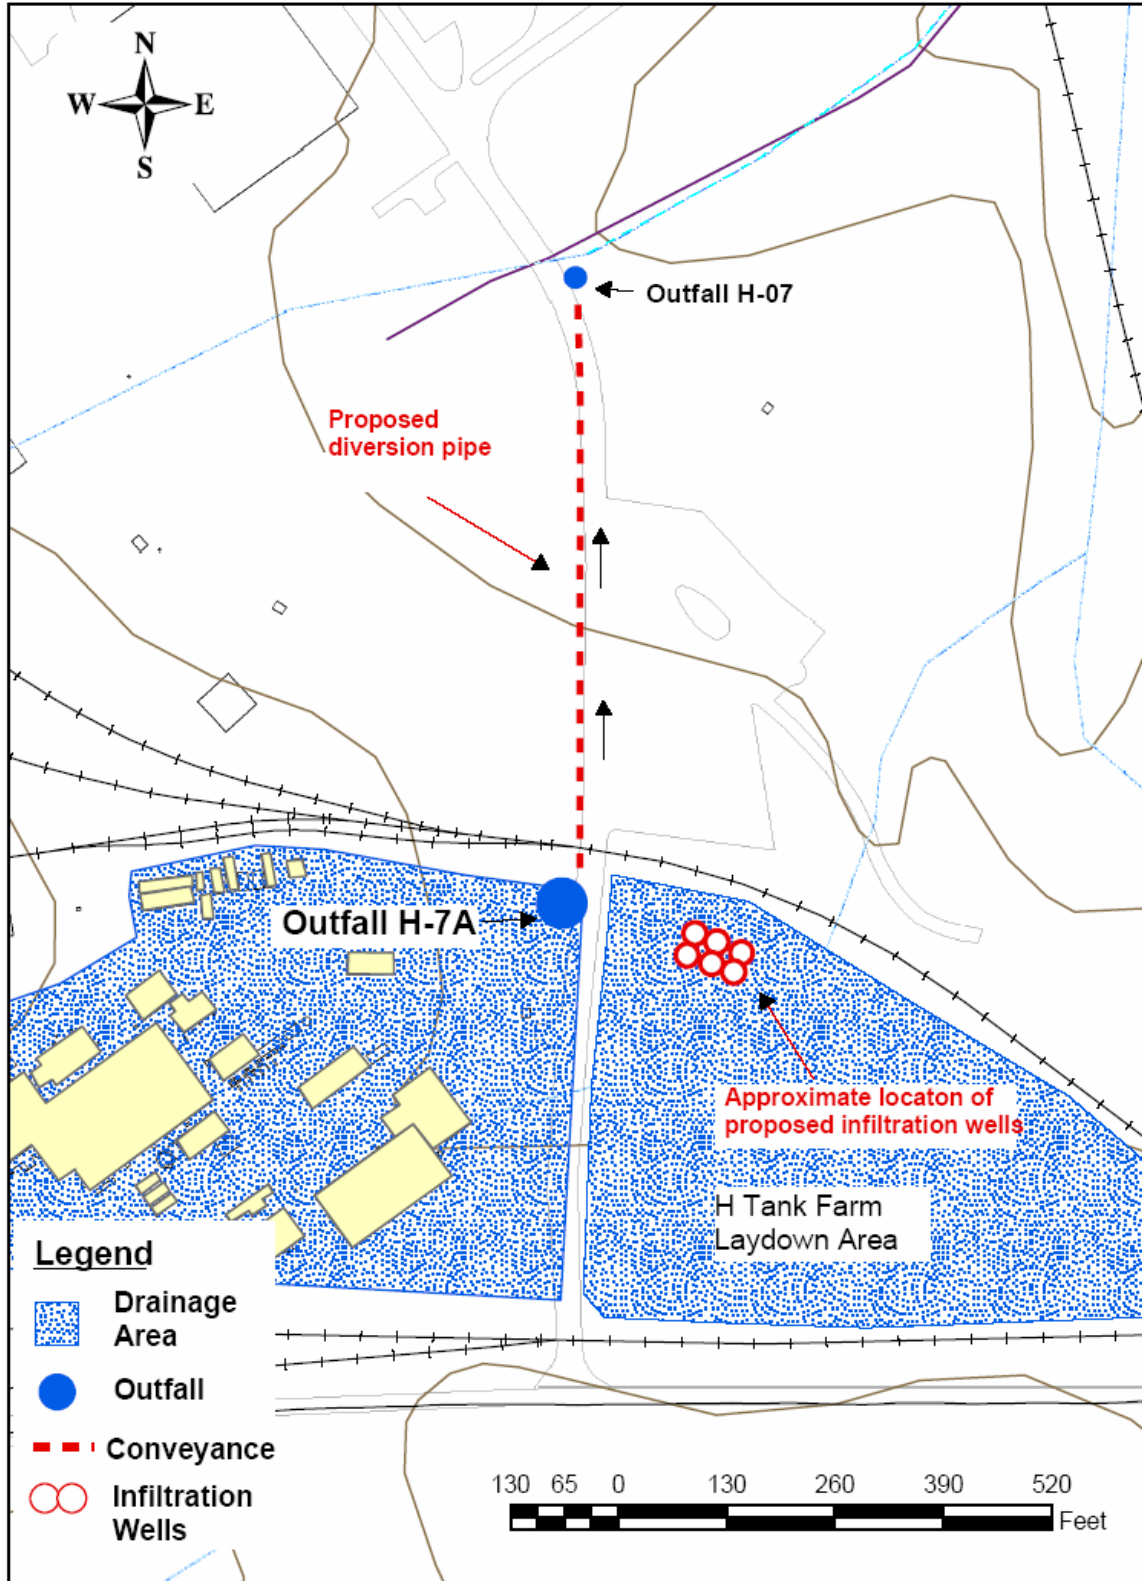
Outfall H-7A, Option C: Diversion of Flow to Outfall H-07 and Install Infiltration Wells for Laydown Yard Drainage.
